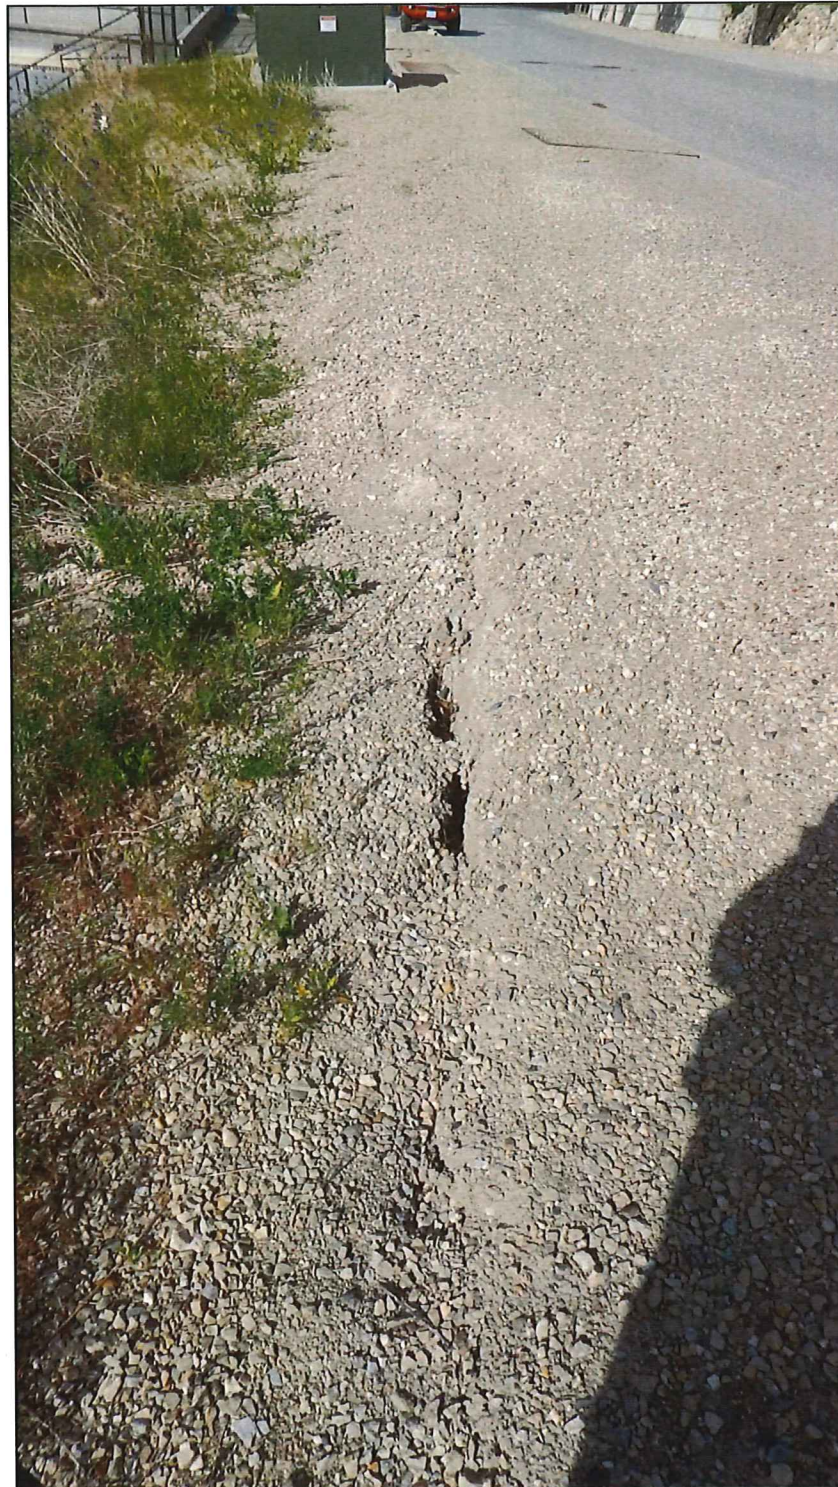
Looking at the tension crack in the shoulder of Loseth Road. The kiosk in the background belongs to Fortis.
